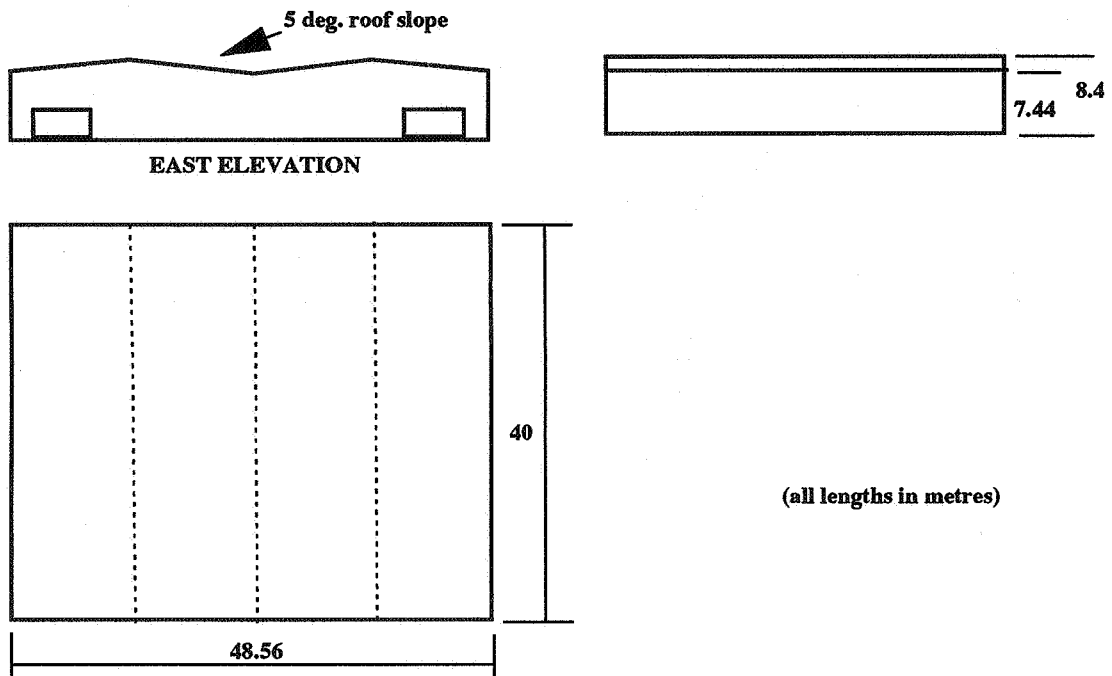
PLAN AND ELEVATIONS OF THE INDUSTRIAL BUILDING
